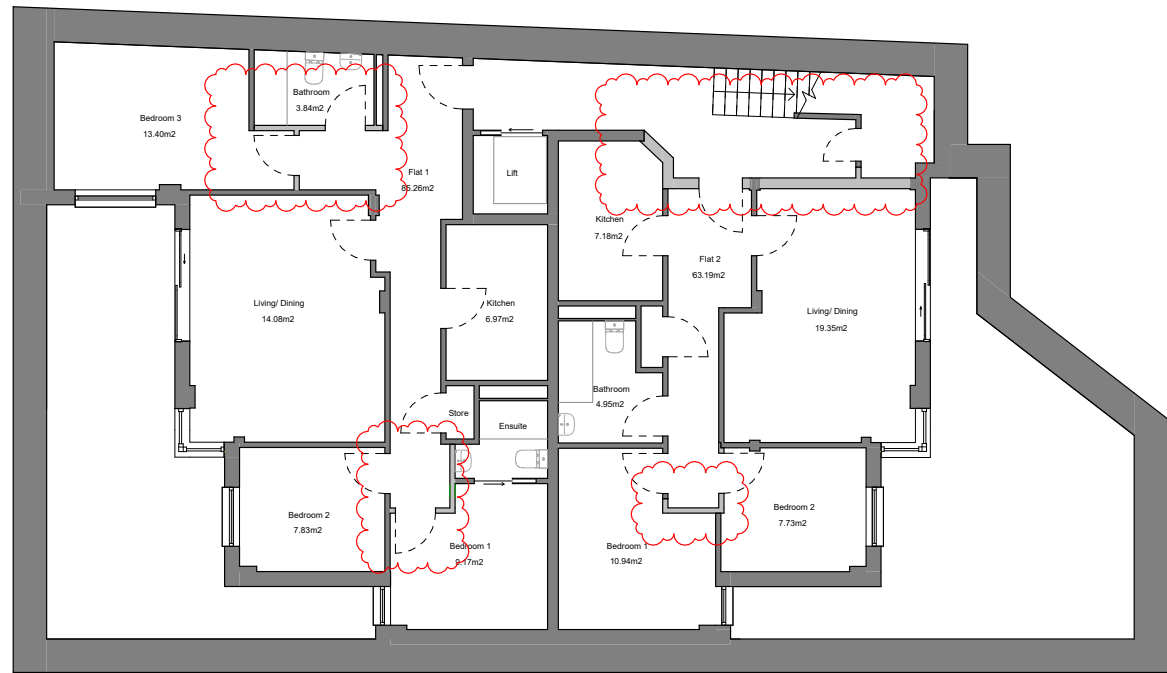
BLOCK 3 PROPOSED LOWER GROUND FLOOR PLAN
